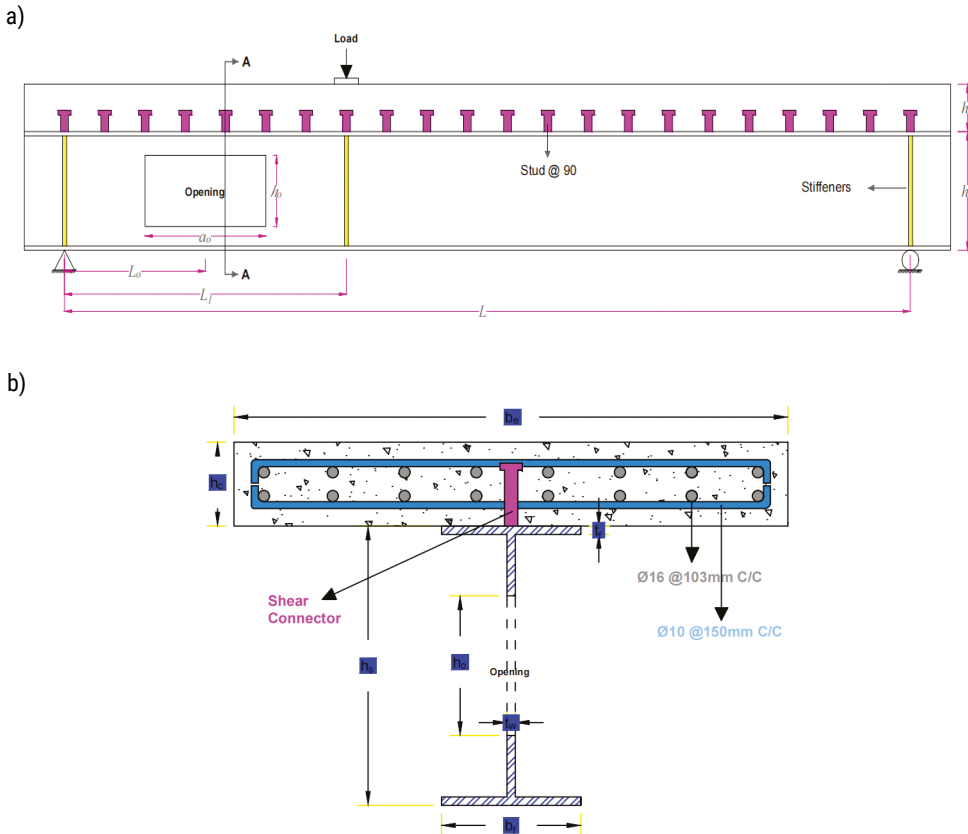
a) Geometrical sizes of the specimen; b) Cross-section of the specimen
